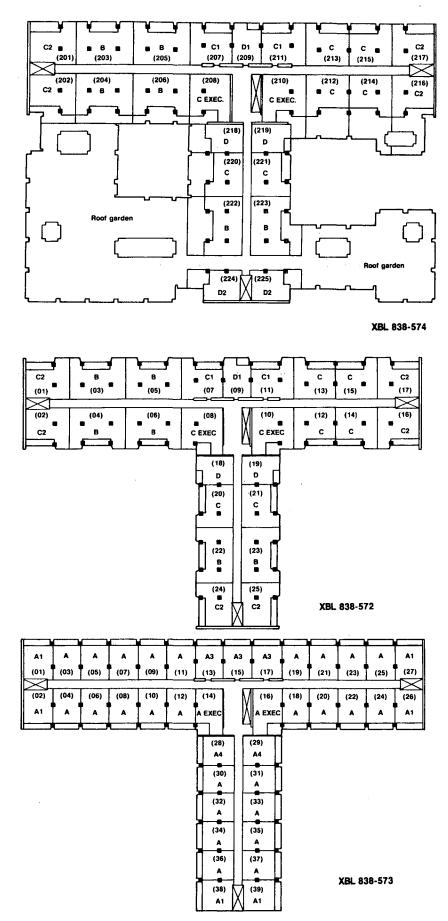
The arrangement of apartments in City Center Plaza. Floors 3 to 11 are identical; floors 12 and 14 are two-story townhouses. The second floor differs slightly from those above it.
